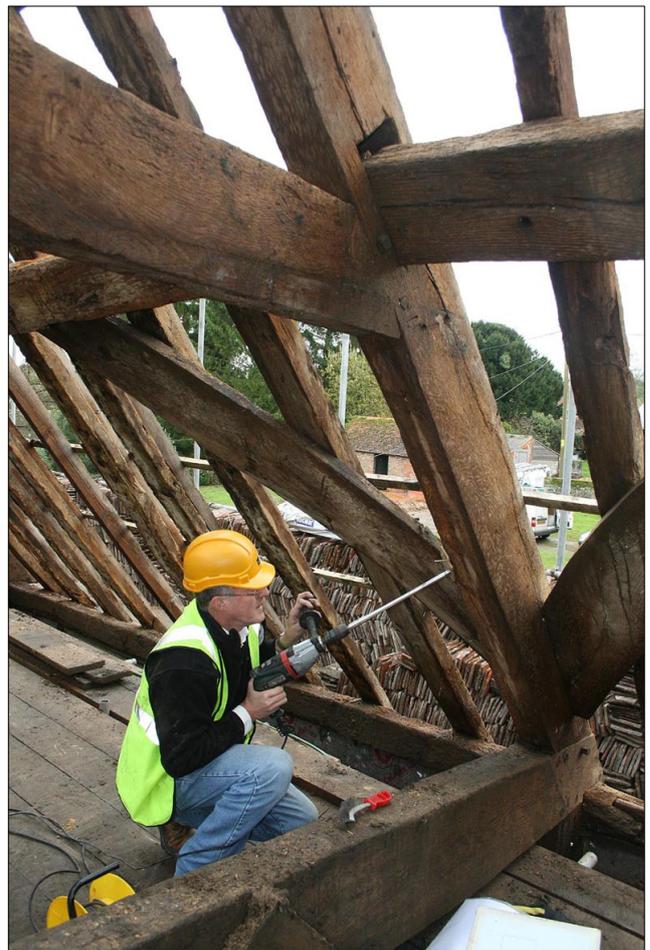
Bay 1, truss 2 (S). Facing south-east.
